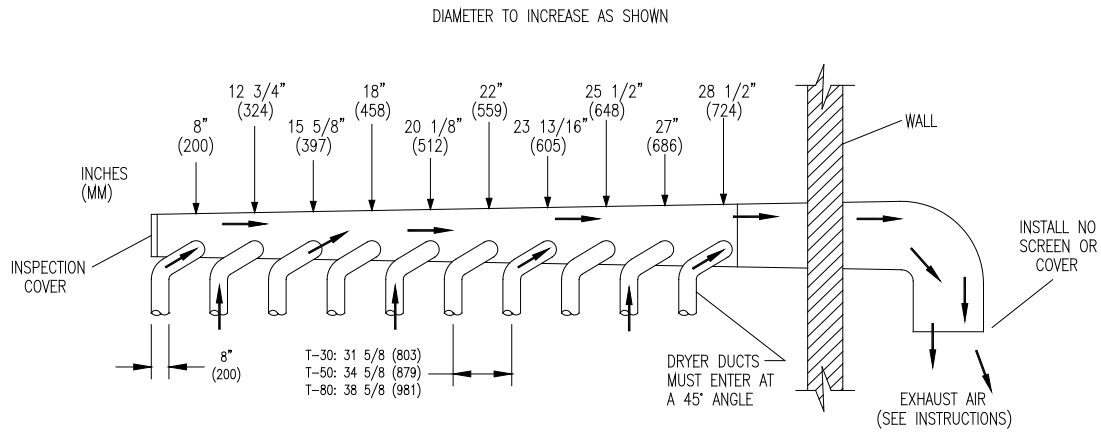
Dryer Exhausting Using A Main Discharge Duct
